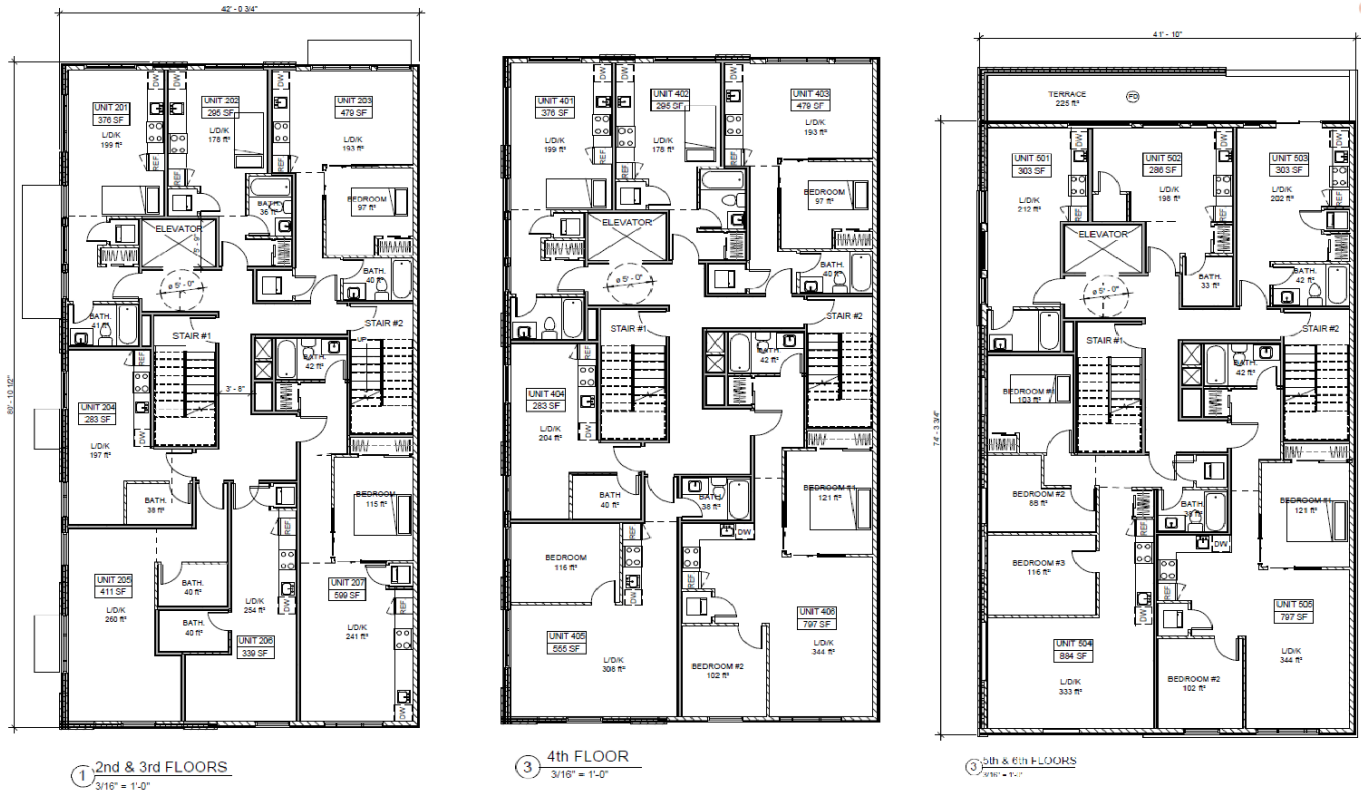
Architectural drawings for subject site, 2nd floor to 6th floor
